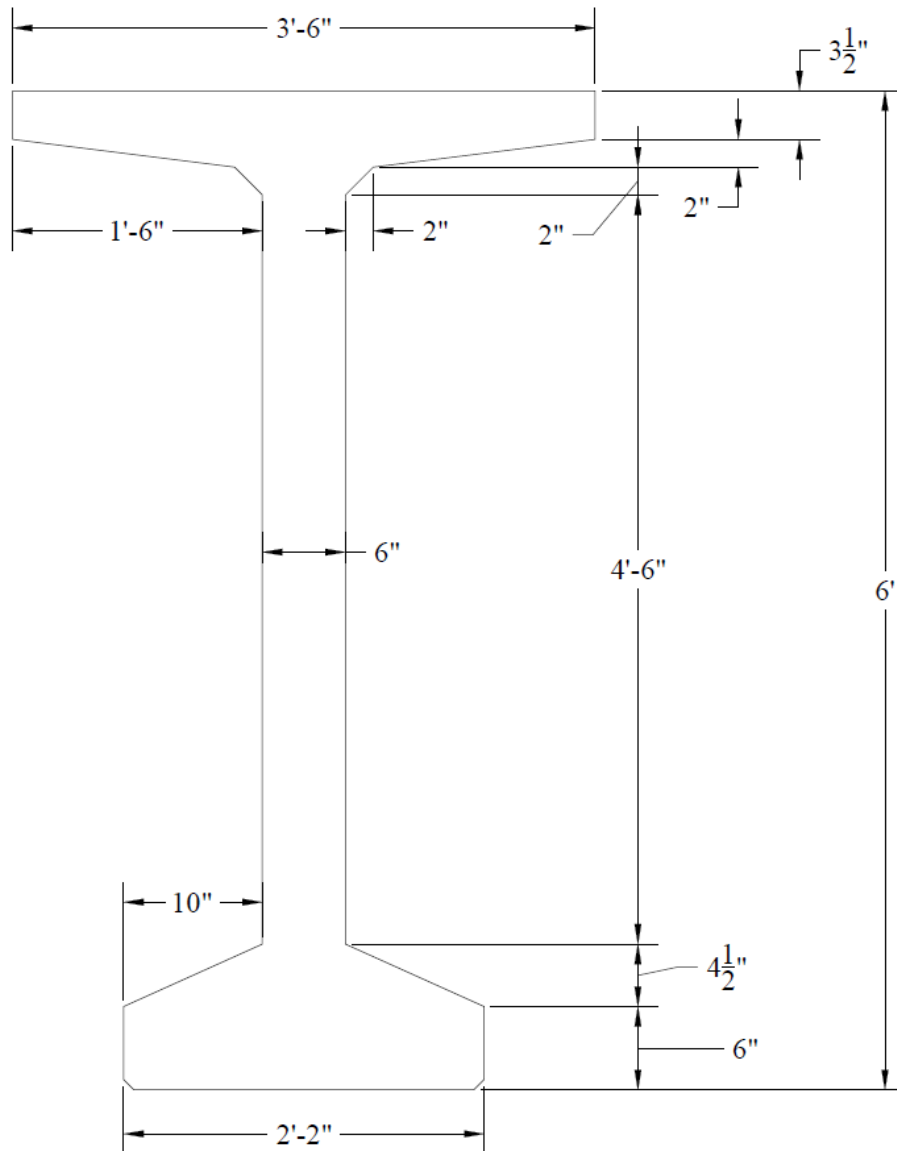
Type BT-72 Prestressed Girder (SUM-1)
